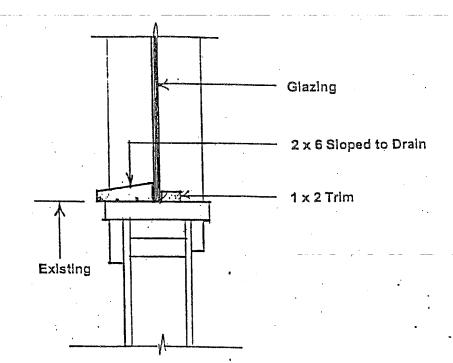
J STANDARD DETAIL - GARAGE
